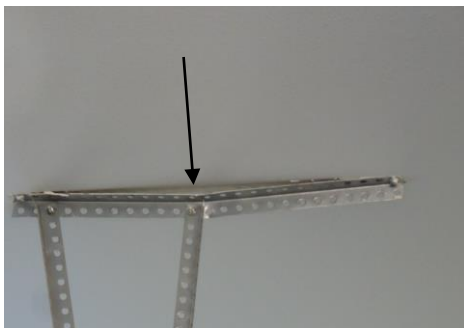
FRAME FOR GARAGE DOOR IS BUCKLING AT GARAGE MOUNT
